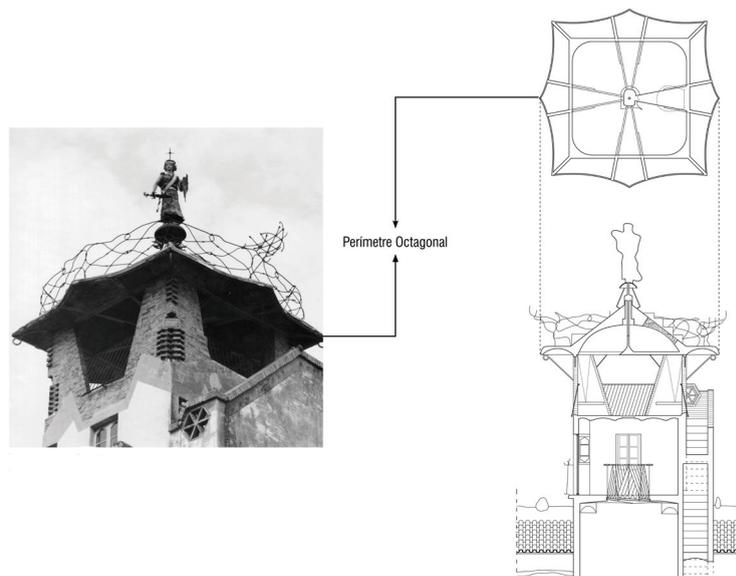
Casa Bofarull. Photograph and drawings in plan and section of the tower's roof (drawing by Arnau Hugué).
